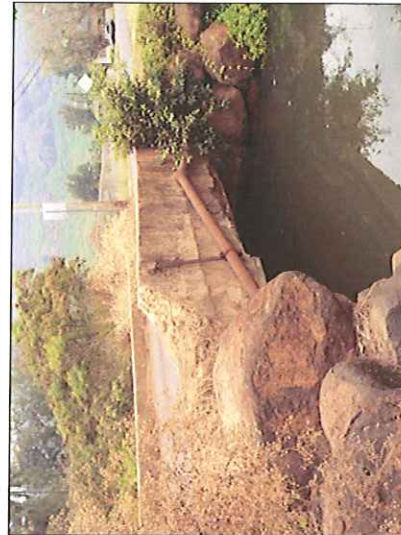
Old bridge spanning Pu'ali Stream, facing north
